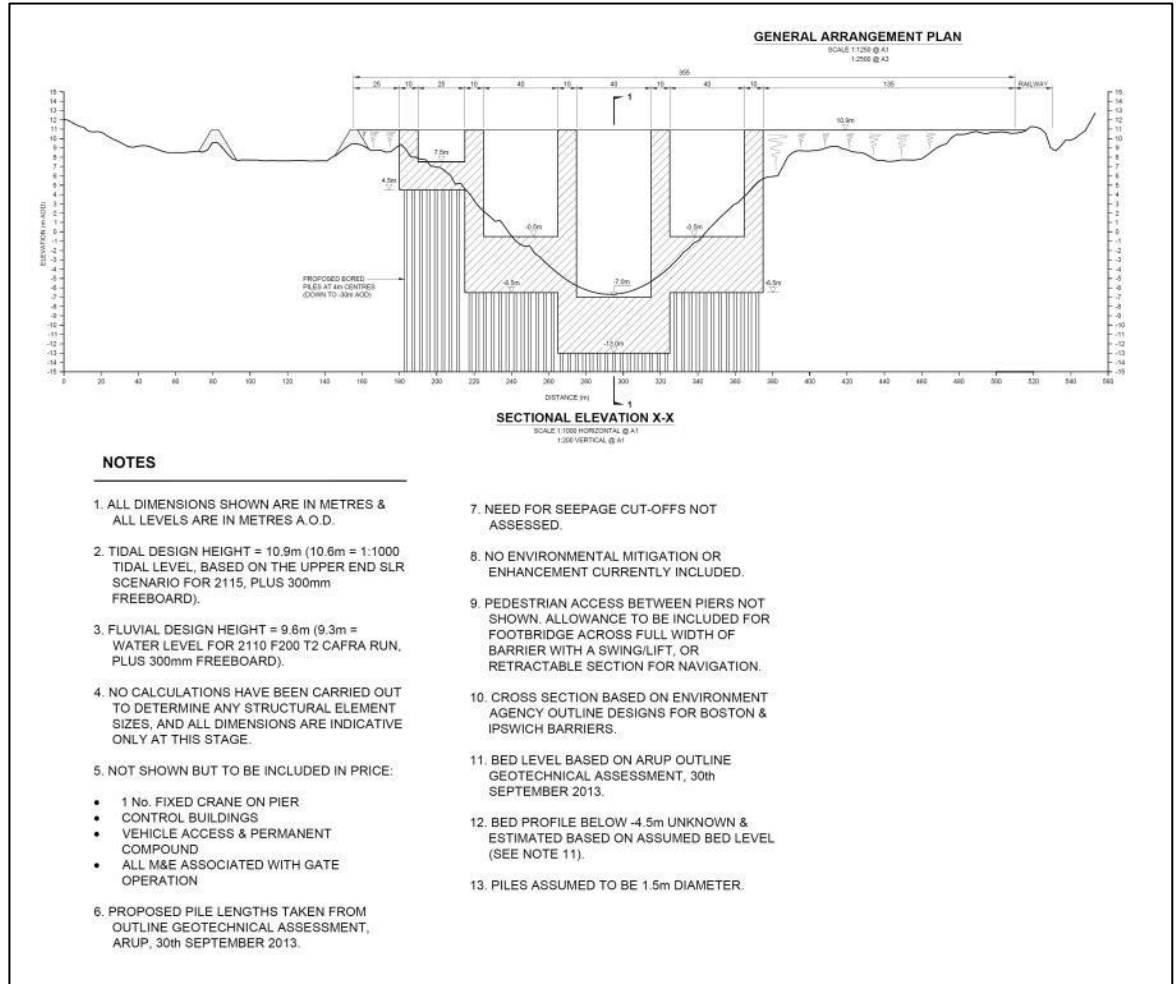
Indicative cross section for a Wide Barrier at Pill-Shirehampton
